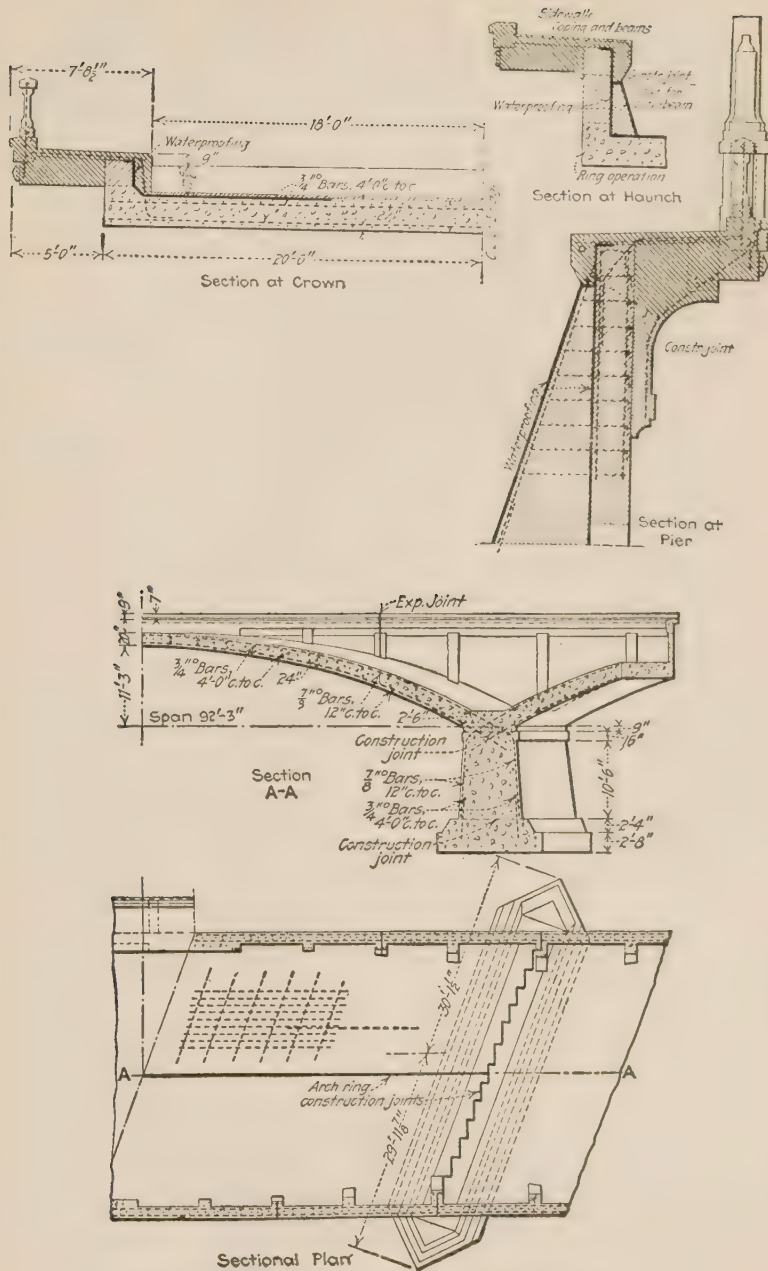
Details of Chemung River bridge, Corning, N. Y.
